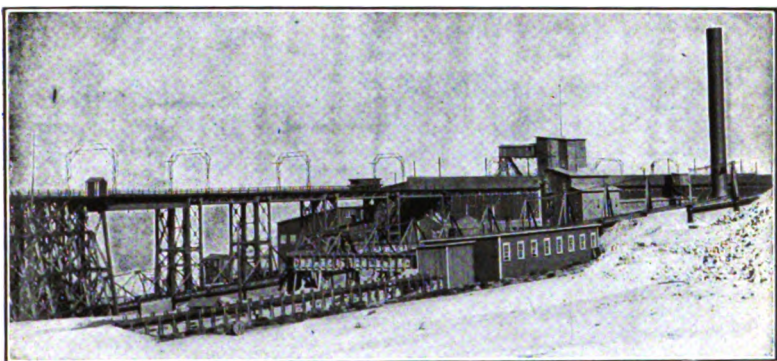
A—STEEL SUPPORTING STRUCTURES ON TRESTLE
